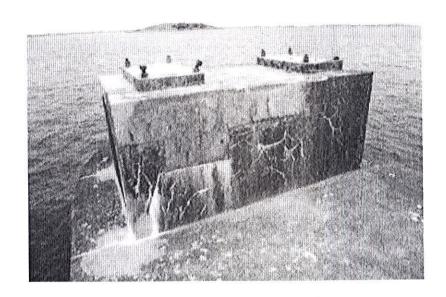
Photo 19 Appendix D North Pedestal on Pier 7 with Cracking, Delaminations and Repairs
